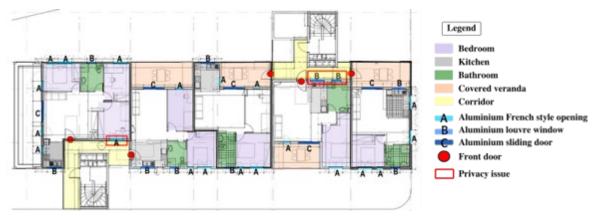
Floor plan of the first floor of the Niama building [1]. Design: Co-architectes.
